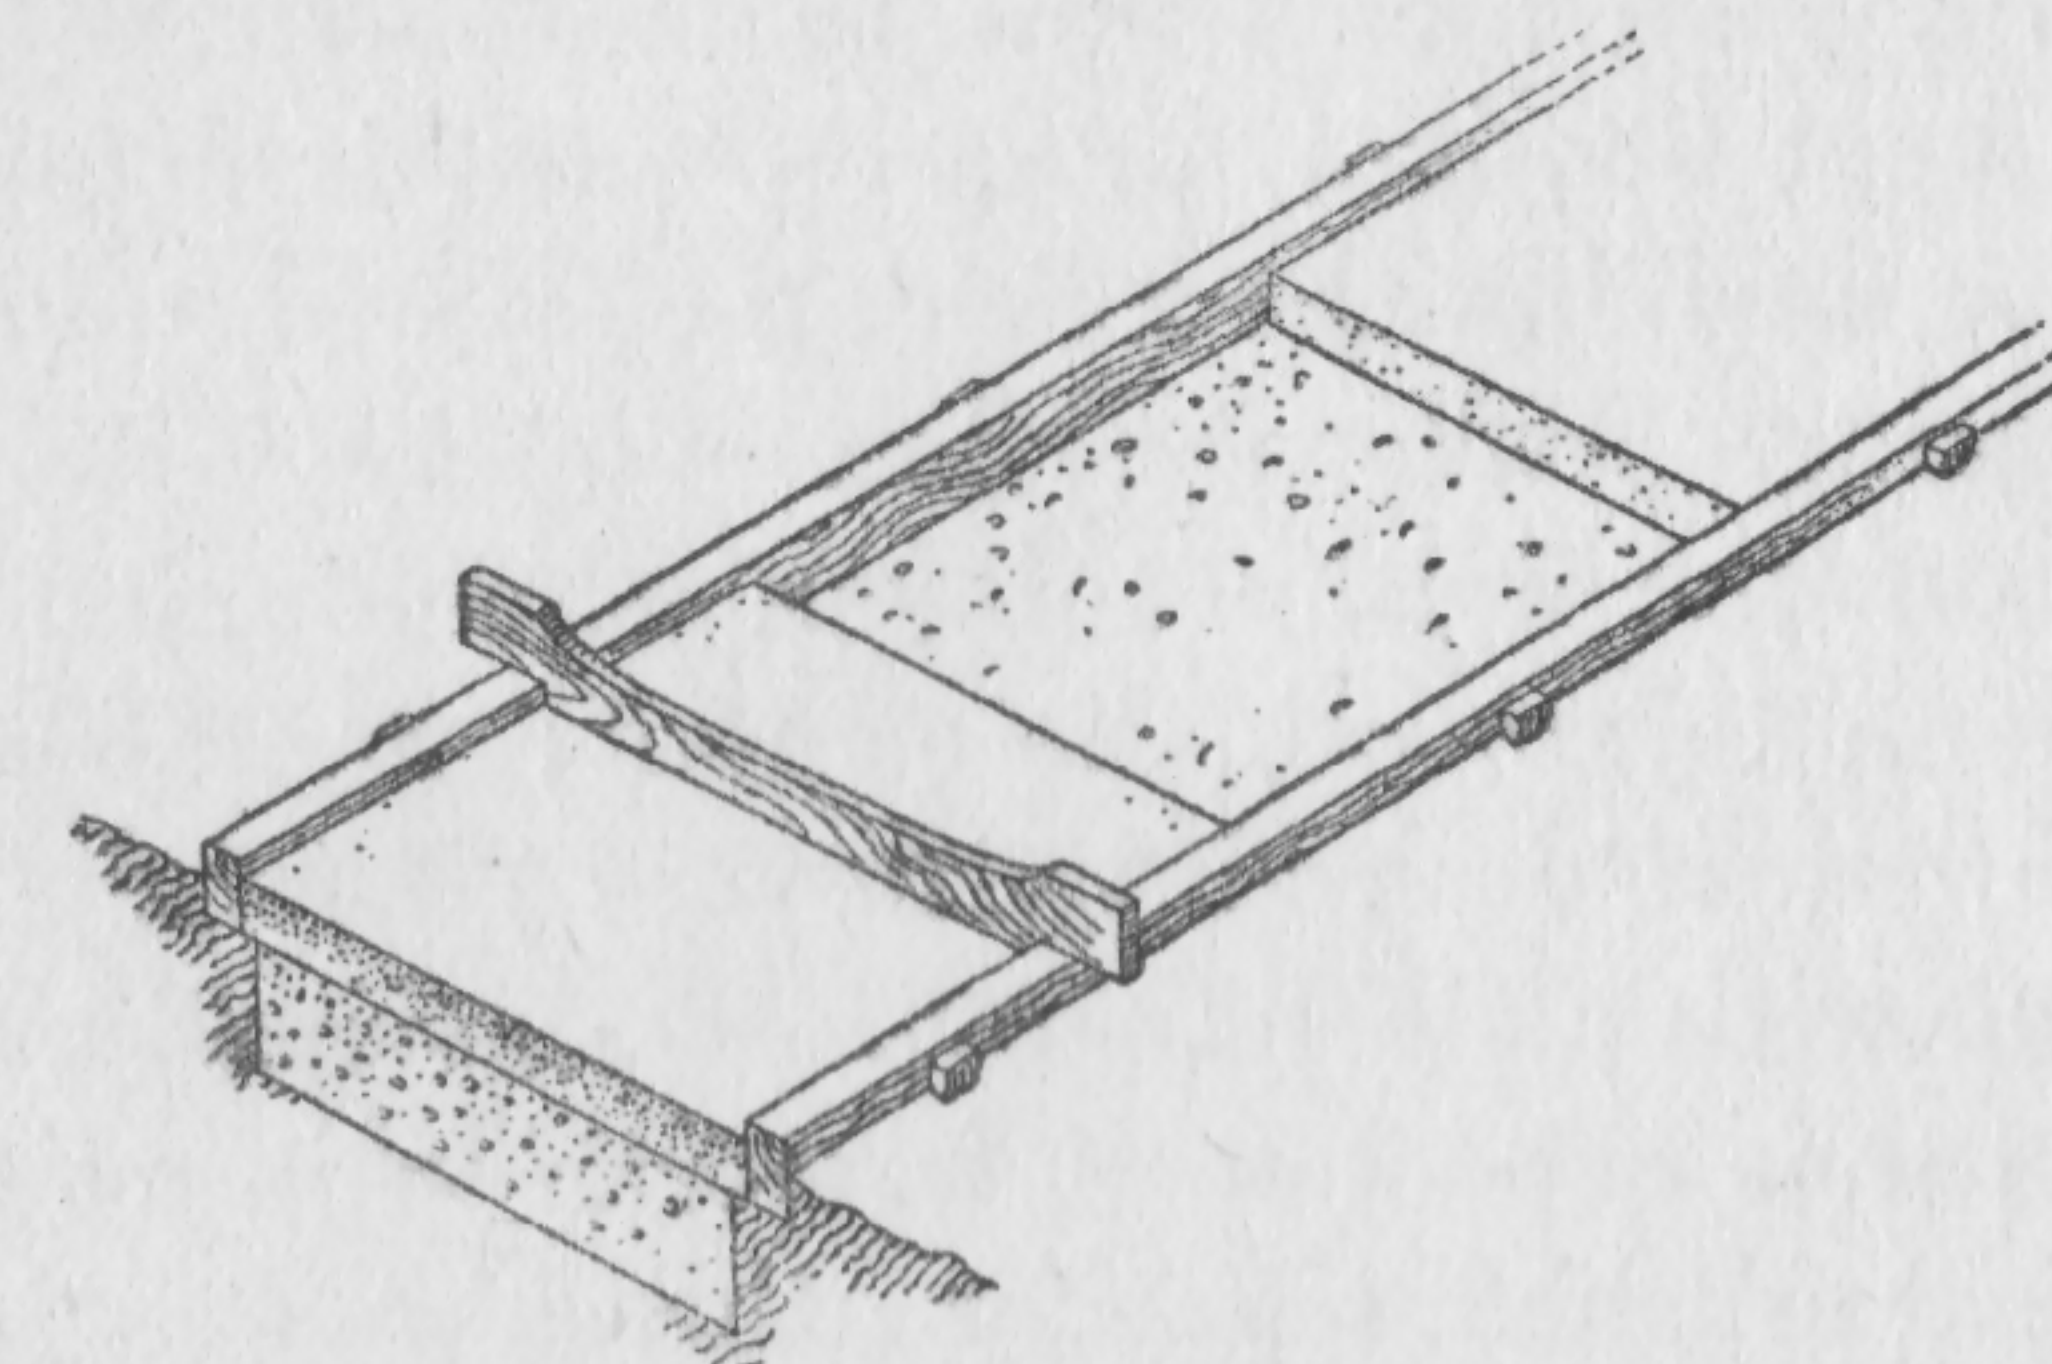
The construction of a cement sidewalk. The concrete is laid on a foundation of cinders. Alternate sections are filled first. The dividing boards between the sections are removed, as here shown, after the first sections to be laid have set. Then the other sections are filled in. The striking board slides along the 2×4 inch side members of the form, to level the concrete for the top surfacing of cement. The crown line on the upper side of this board is much exaggerated in the drawing.
